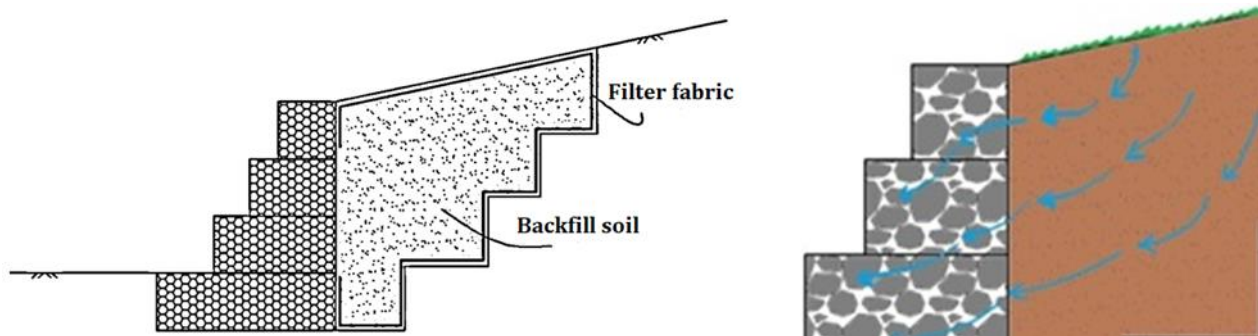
Application of filter fabric and permeability of gabion retaining wall [12-13]
